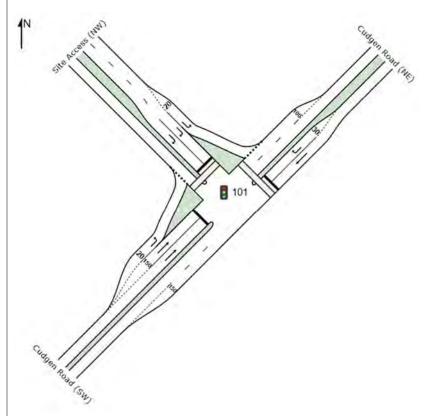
Cudgen Road/ Site Access SIDRA Intersection Layout Source: Bitzios
